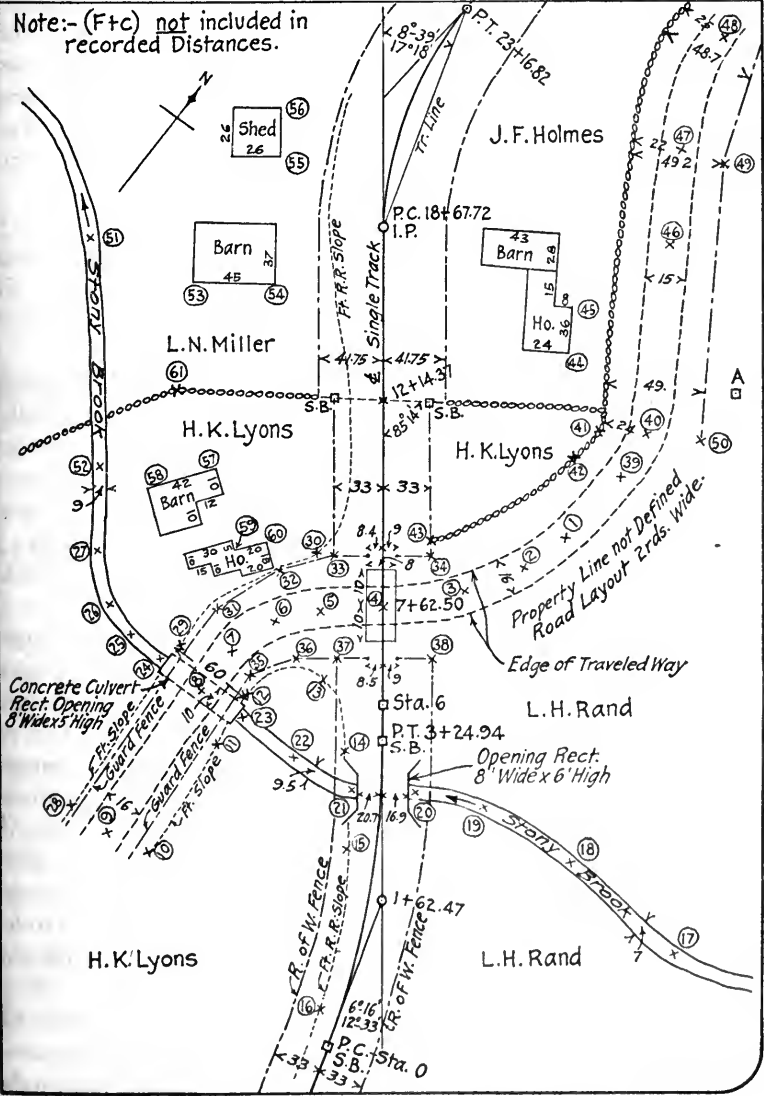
STADIA SURVEY REQUIRING ELEVATIONS.
